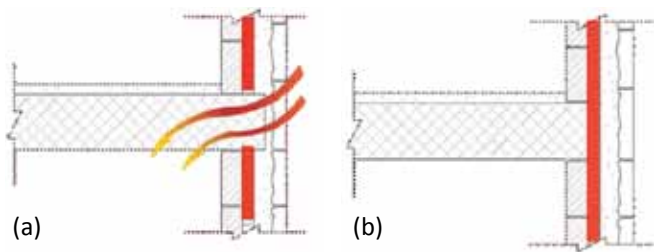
The floor-wall connection as thermal bridge (a) and with good insulation (b)
